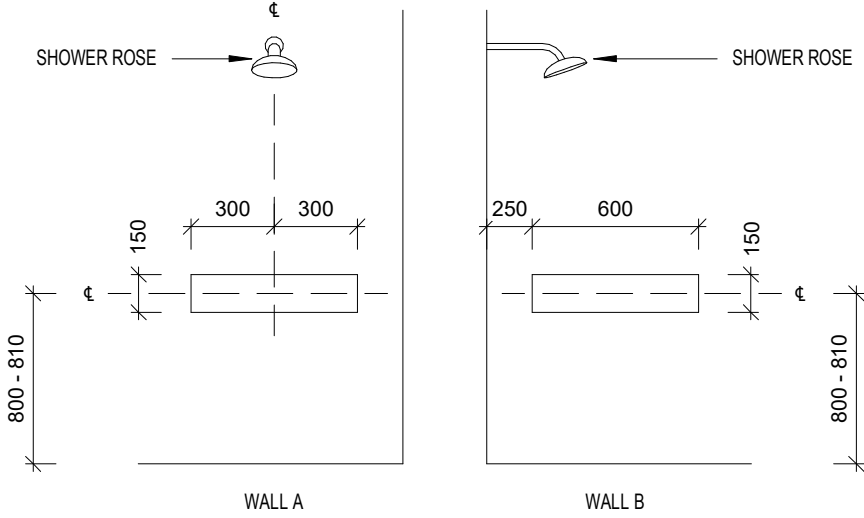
C - LOCATION OF NOGGINGS FOR SHOWER WALLS
